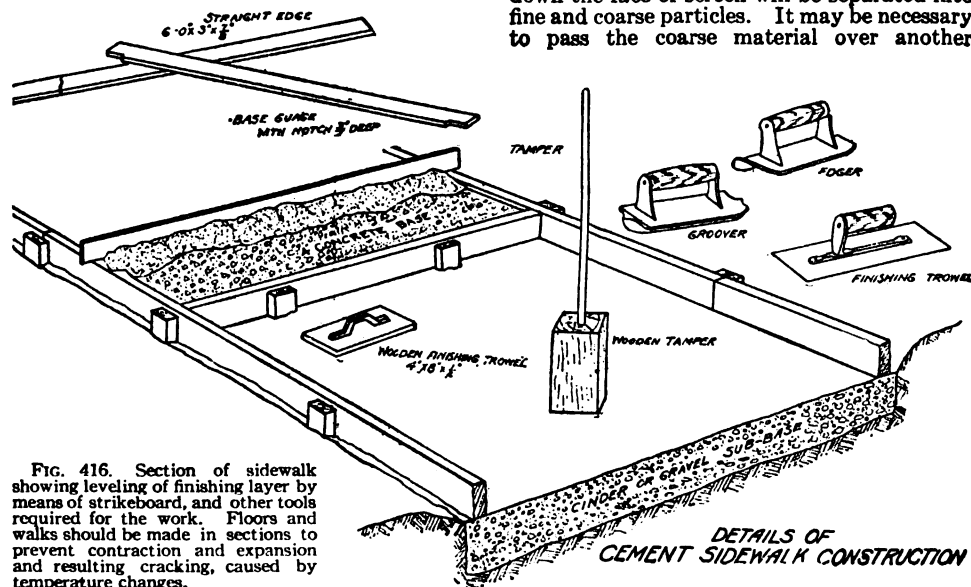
Section of sidewalk showing leveling of finishing layer by means of strikeboard, and other tools required for the work. Floors and walks should be made in sections to prevent contraction and expansion resulting cracking, caused by temperature changes.
